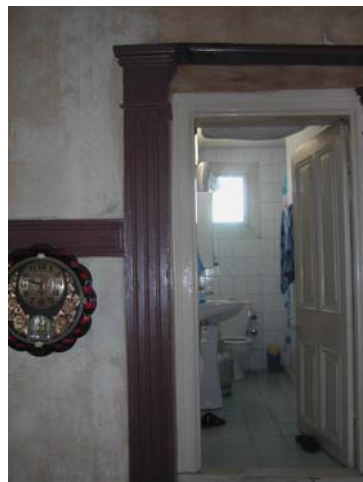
Wet space on the first floor inside the building, (Halil Rıfat Paşa Street, No. 74)
